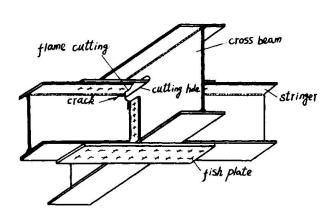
Cracks at the toe of filled welds of stringer flange and connecting plate between cross beam and stringer.
